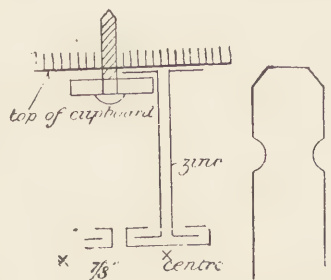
ARRANGEMENT FOR HOLDING CHARTS AND DRAWINGS.
